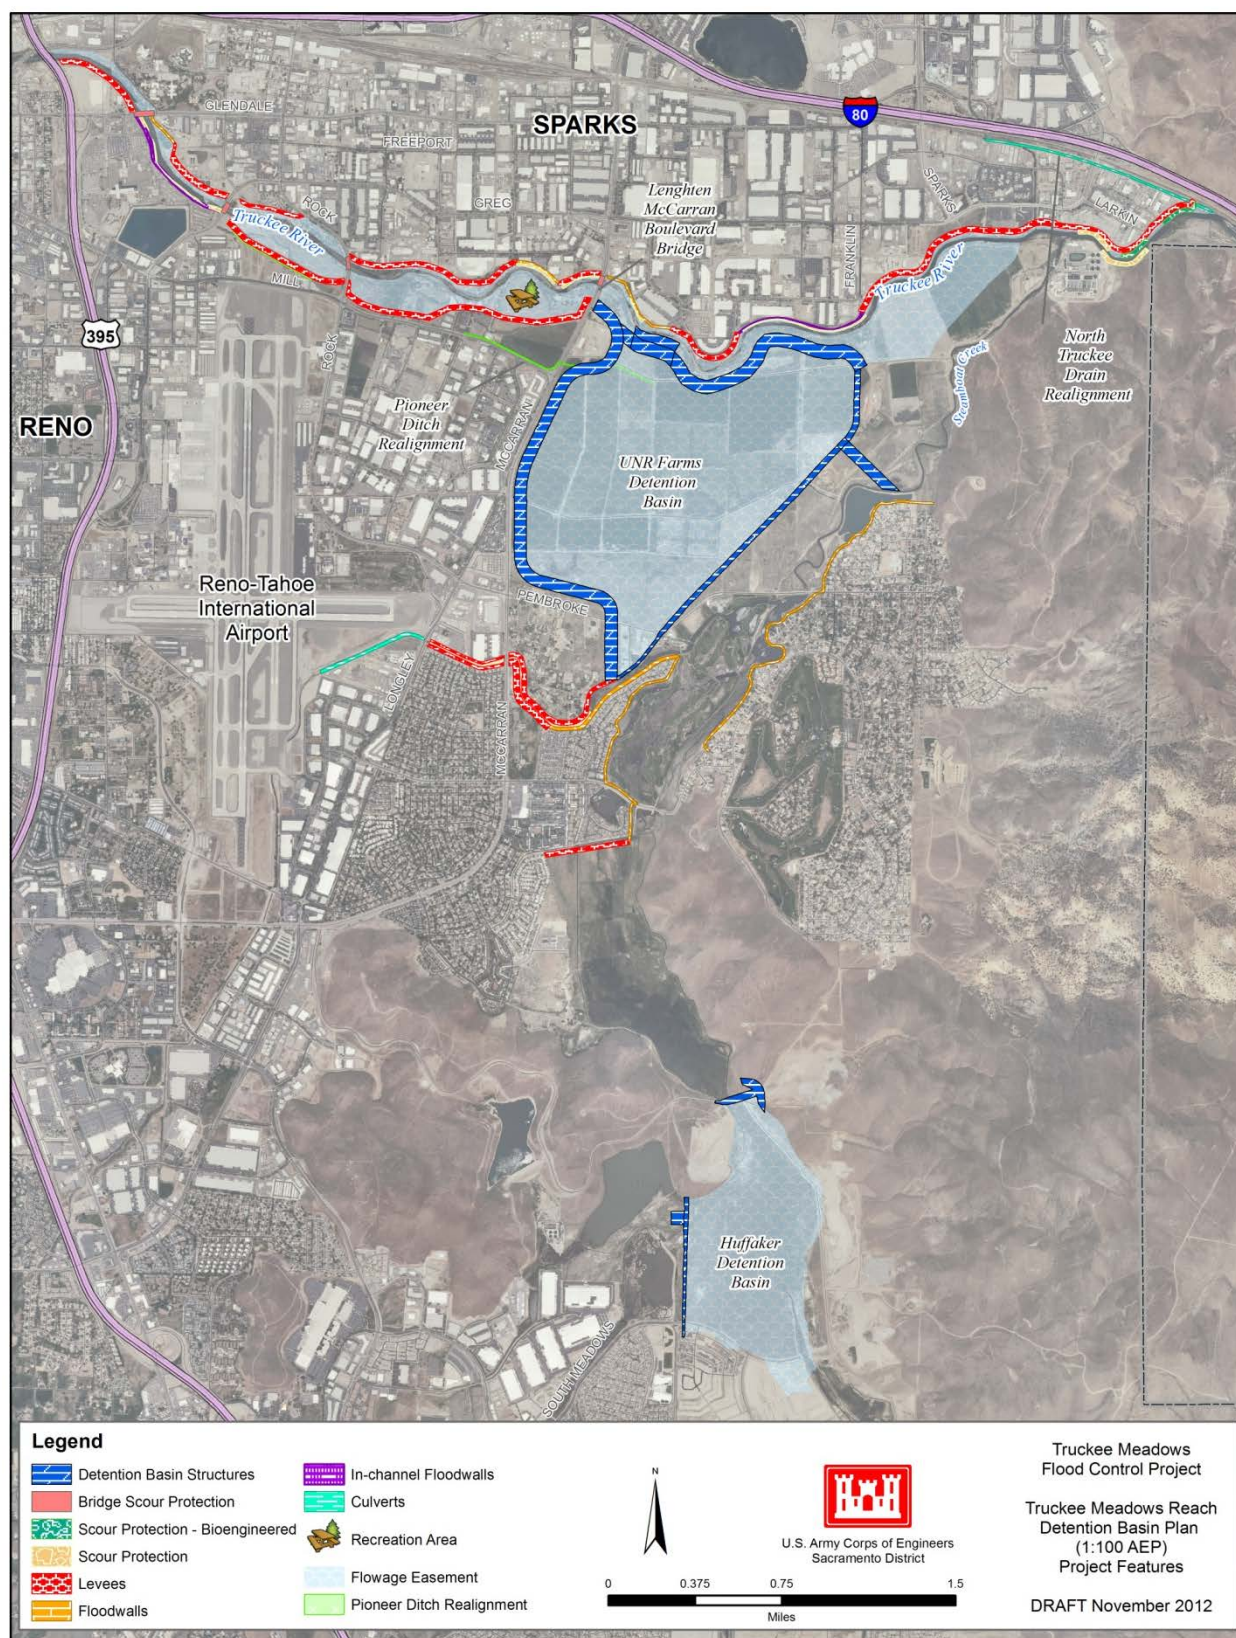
Alternative 2-Detention Plan – Truckee Meadows Reach Project Features.
